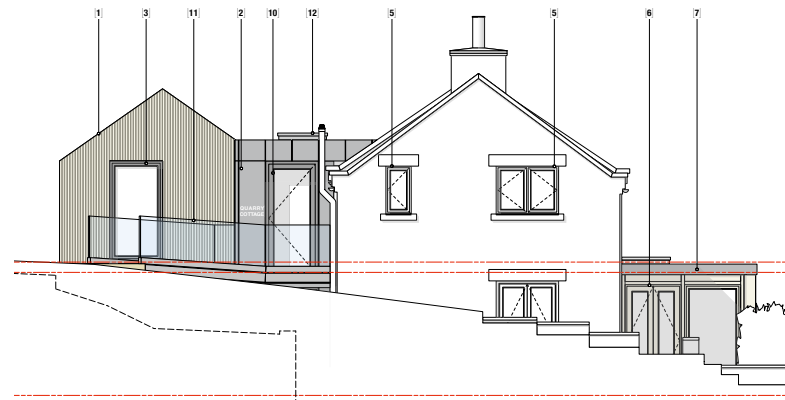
Extract from PL_003 Proposed Elevations and Sections: Sheet 2 showing the south-west elevation.
